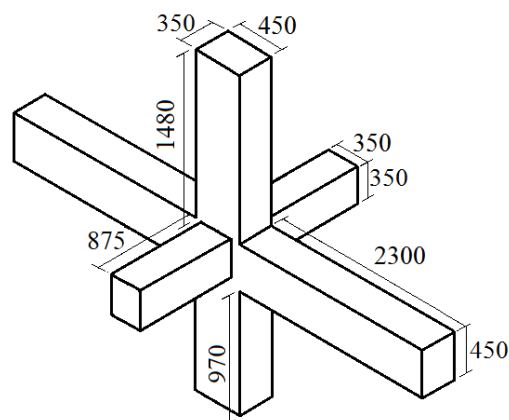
Dimensions of test specimens (dimensions in mm)
